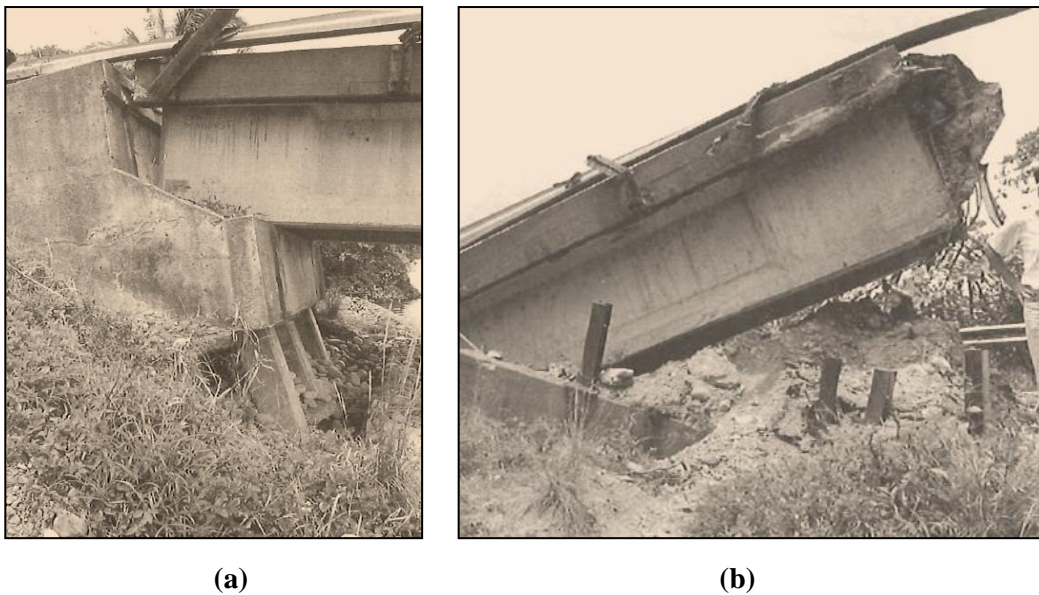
Damage to the abutment in 1990 Costa Rica Earthquake: a) abutment slumping and rotation, Rio Banano Bridge; b) abutment failure due to passive pressure, Rio Vascaya bridge [7]
